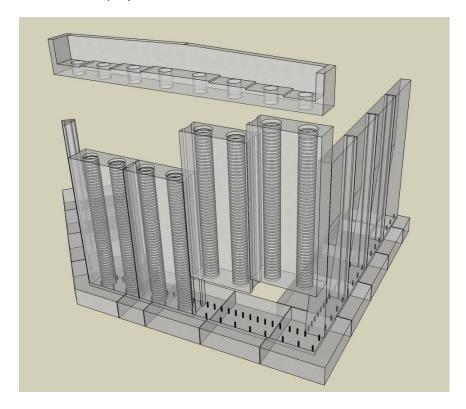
Transparent View of a Cantilever Abutment Showing Corrugated Pipe Voids
